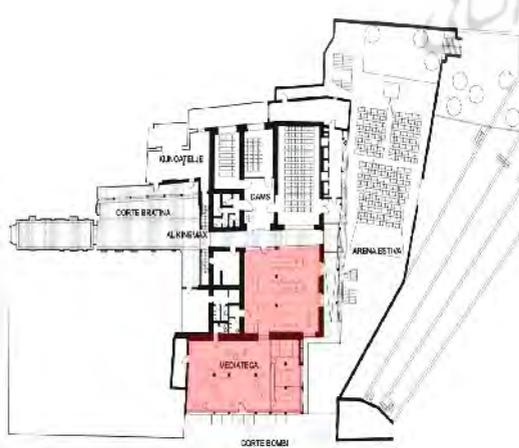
Casa del Cinema Plan (Source: ibid.)
